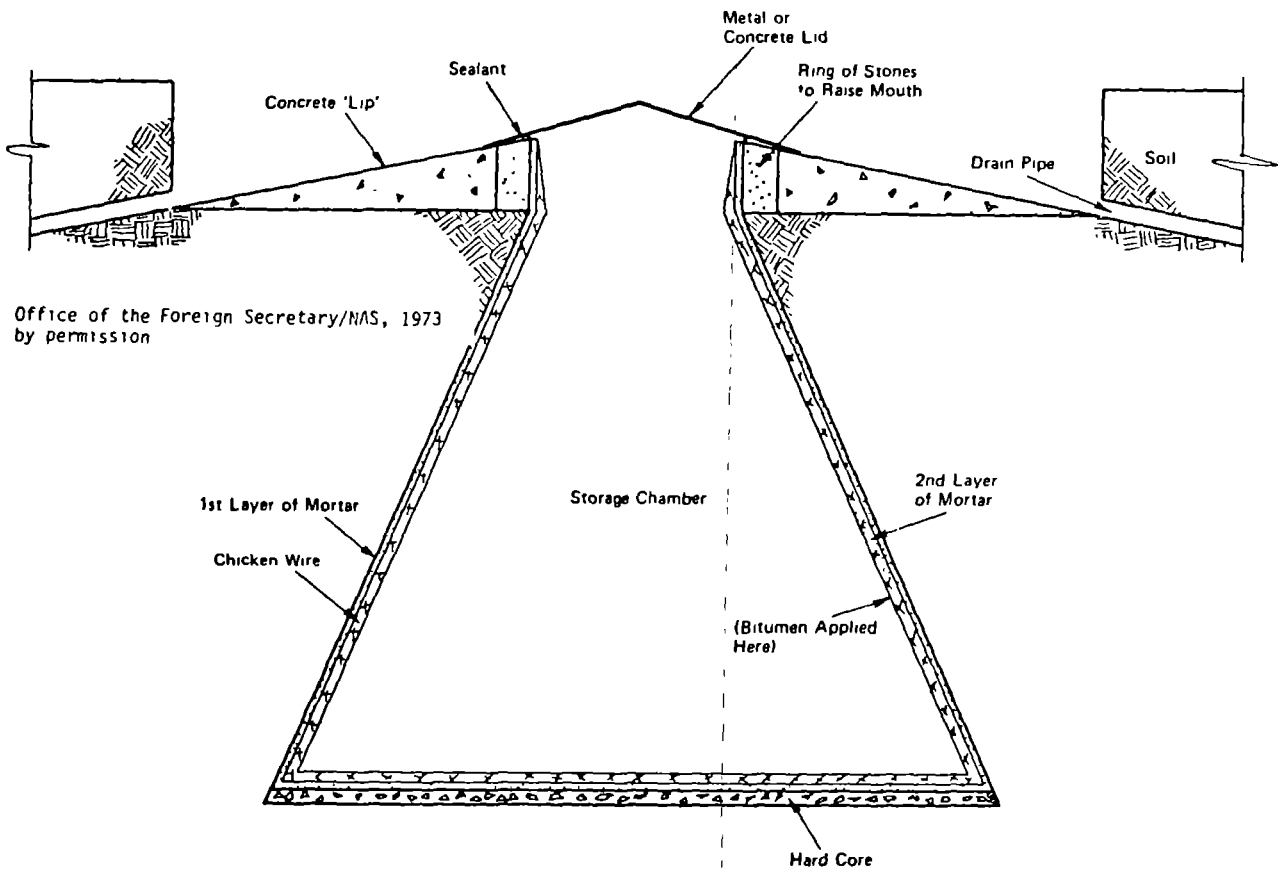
, Cross-section of Ferrocement-lined Underground Storage Pit.
